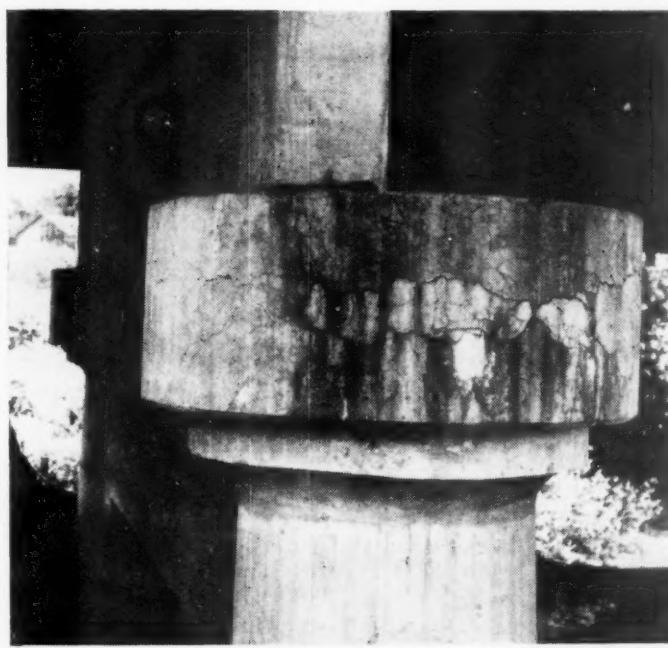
POSSIBLY AN EXAMPLE OF TYPE 4 DETERIORATION IN OREGON SHOWING OPEN CRACKS IN THE PIER CAP.
